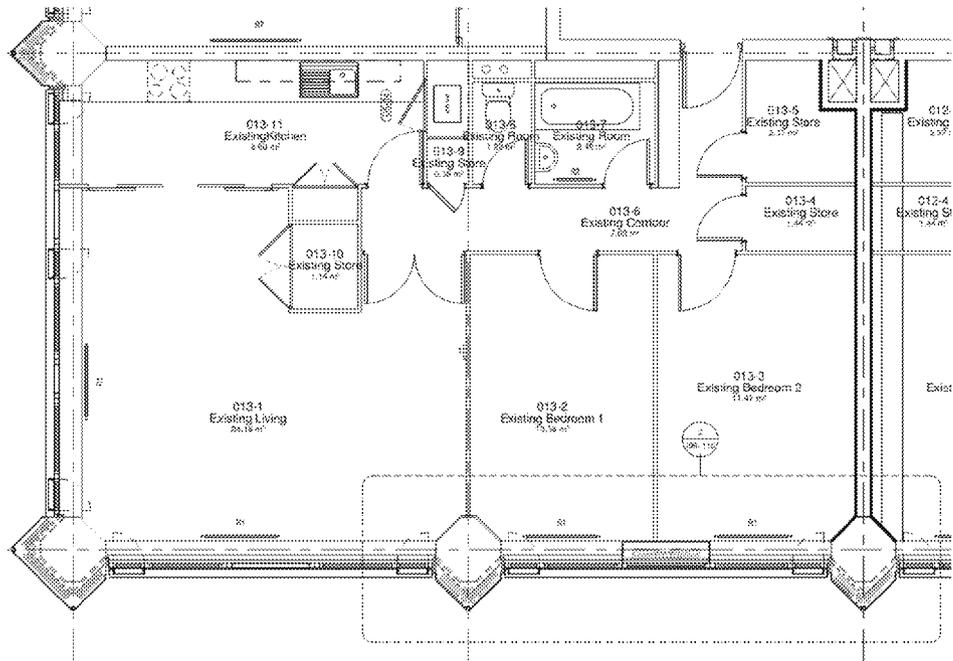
Extract from Studio E drawing 1279 (04) 105 'Proposed Residential Plan' {SEA00010474}
